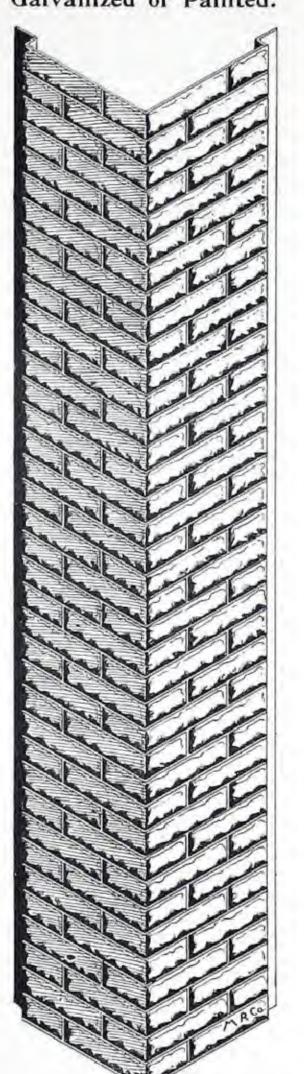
Made in lengths of 8 feet. Covering face 13 x 13 inches. For use with Rock-Faced Brick Siding.
